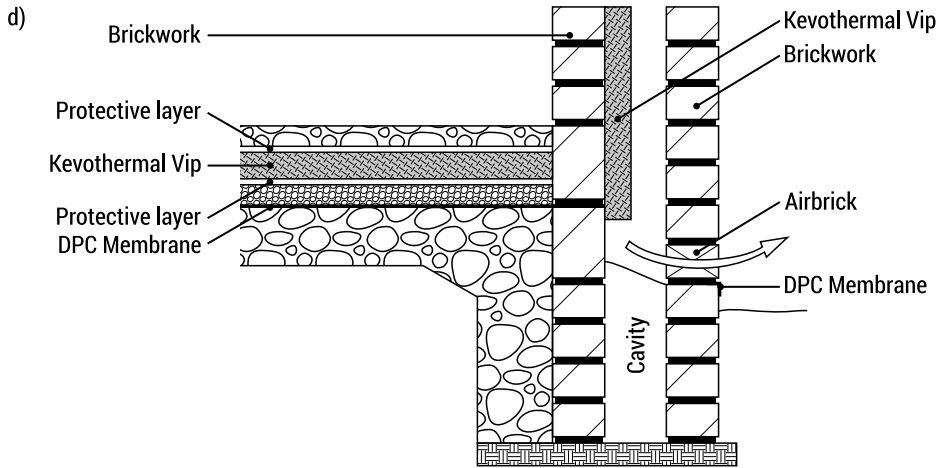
Typical details: (d) – solid concrete ground-based floor (Source: BDA Agreement, 2020)
